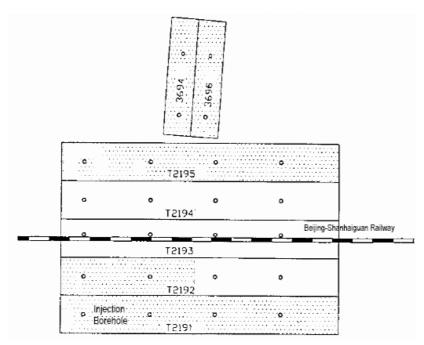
Plan of overburden grout injection at part of Tangshan Mine.
